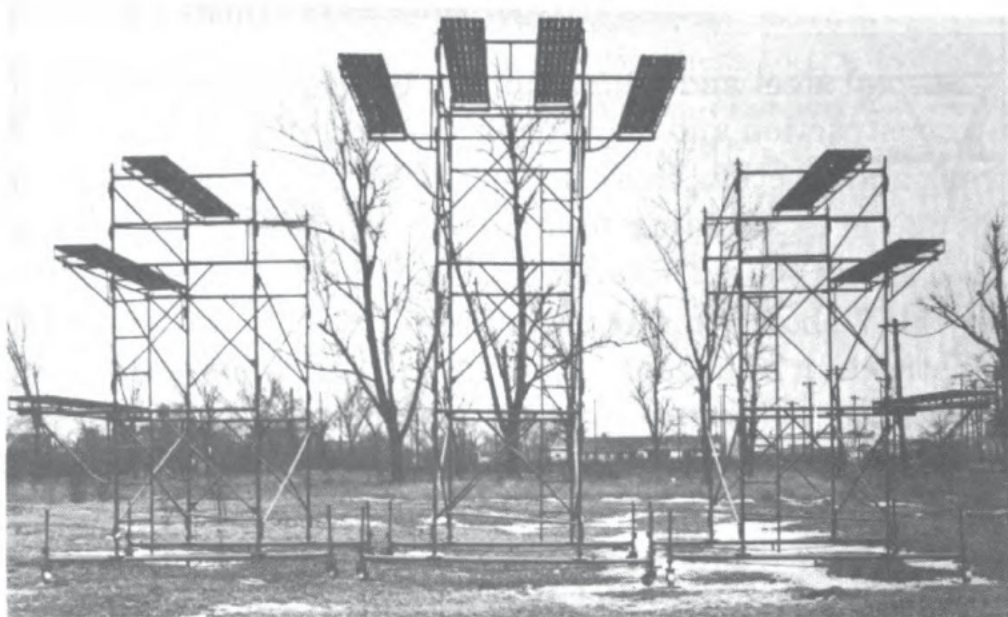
The scaffolding for interior Quonset 40 construction.
